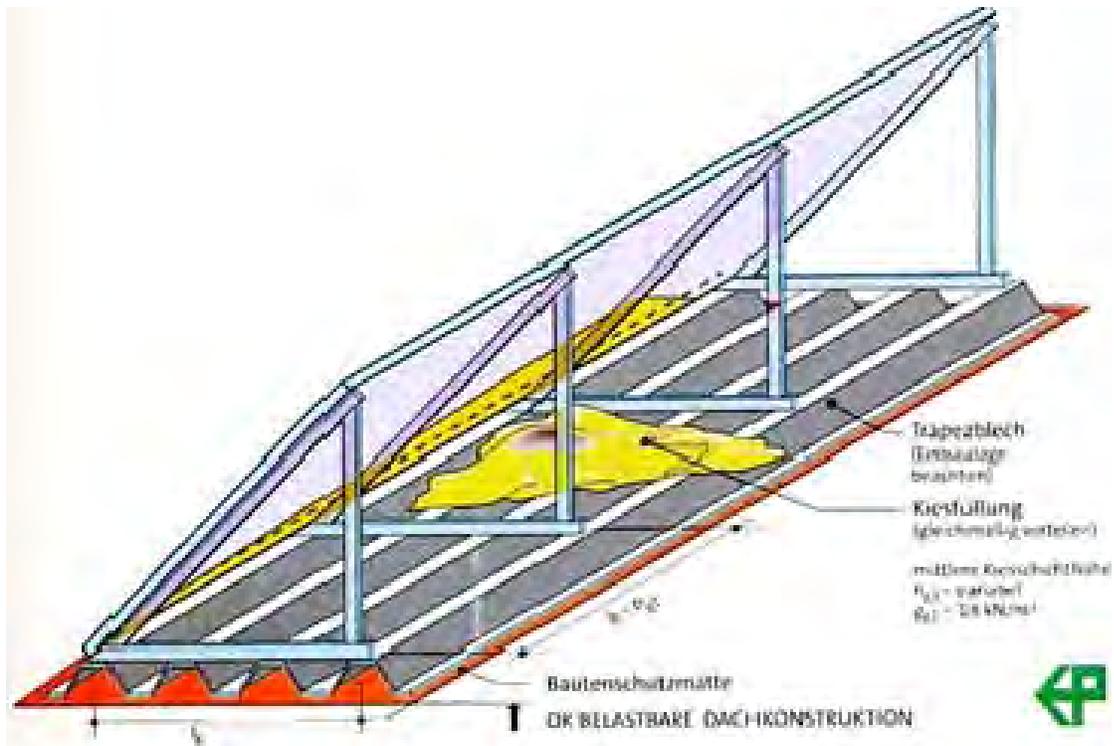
Collectors mounted on a trapezoidal sheet filled with a rock material.
